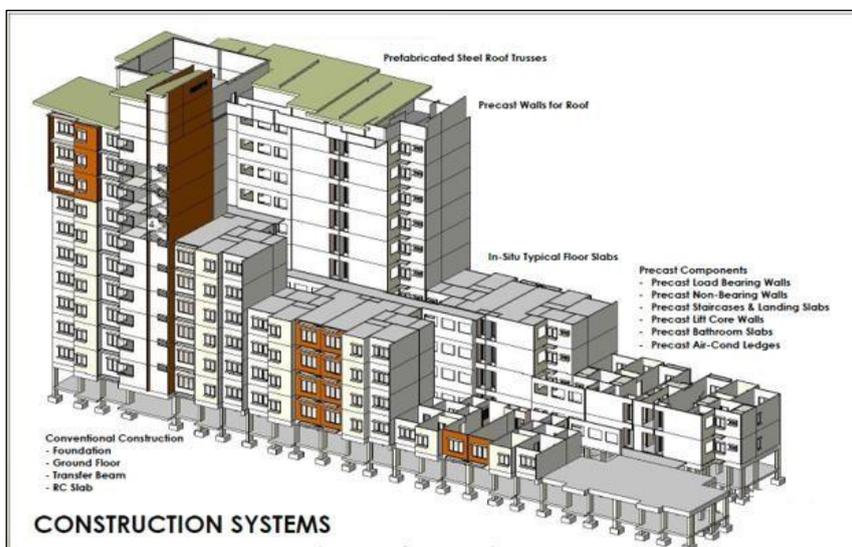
The Construction System for Residential Seri Jati Apartment, Setia Alam
